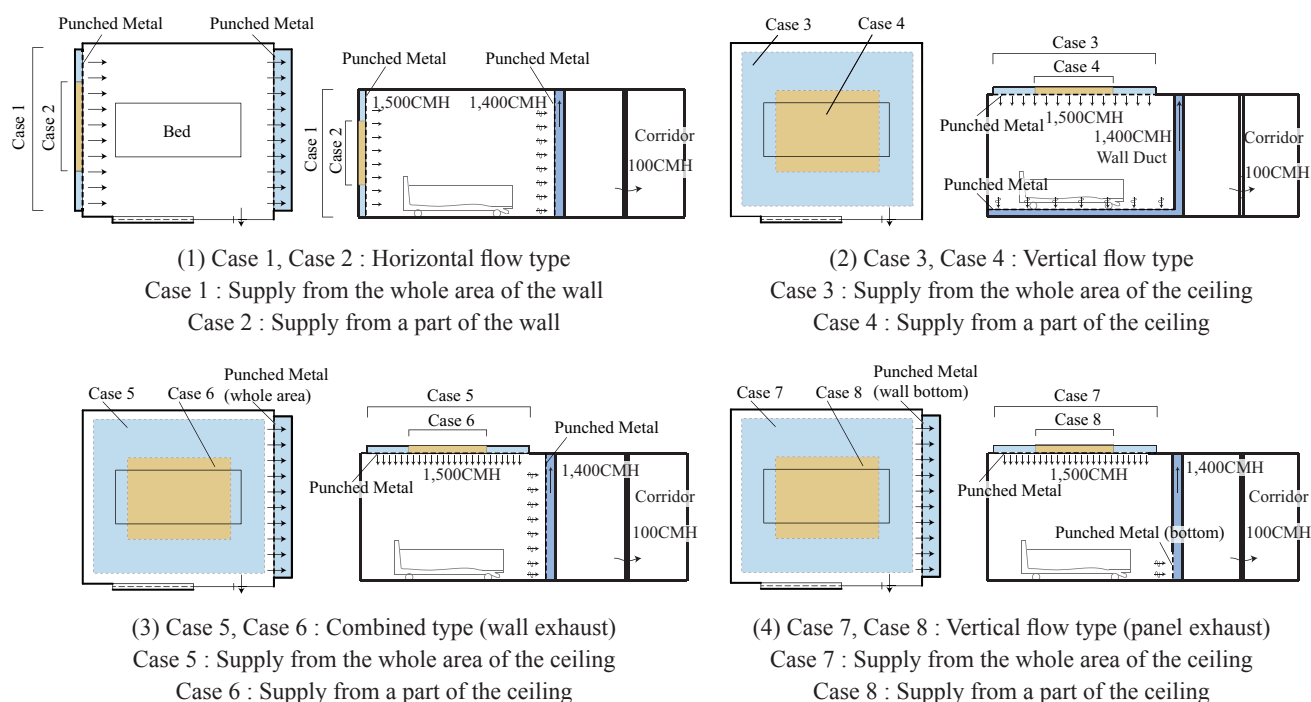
Floor plan and system diagram of ventilation system for bio-clean sickroom
